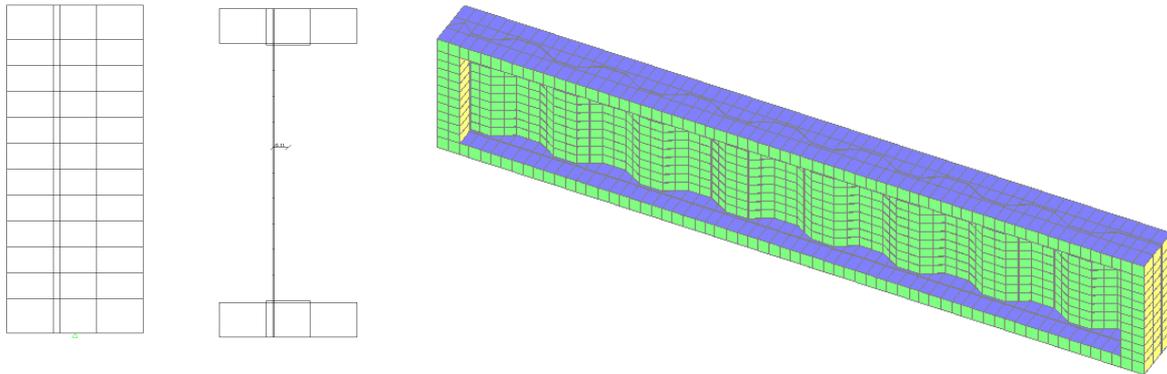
Cross-sections and calculation model of a girder with corrugated steel web
